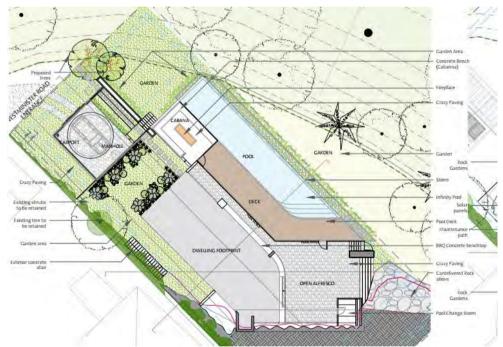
Landscape plan of proposed works. Source: Spicer Architects.
